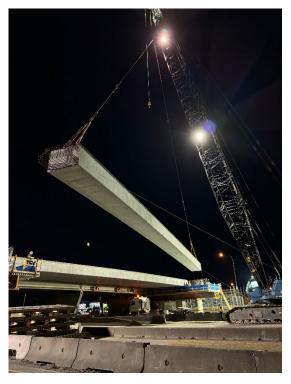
Heavy-lift crane hoisting one of the 50-tonne girders into place
